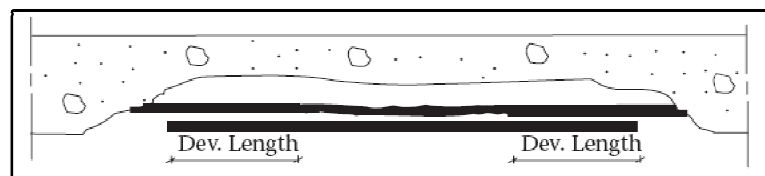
Installing Additional Steel (El-Reedy, 2008)
